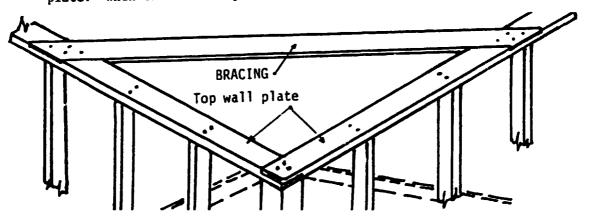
shows bracing arrangement for corners of external wall junctions (high wind region).
